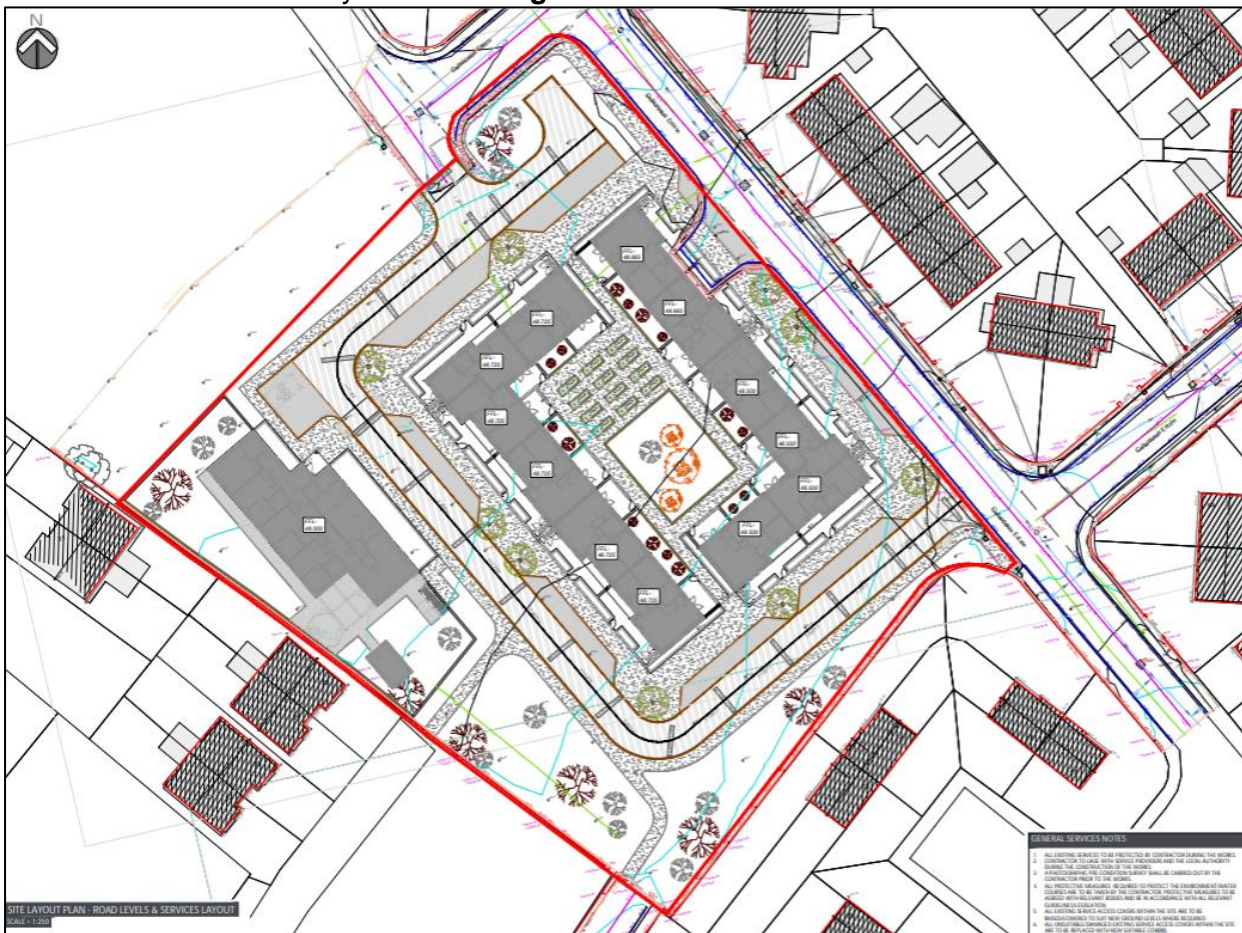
Site Layout Plan (Source: Galway County Council)
